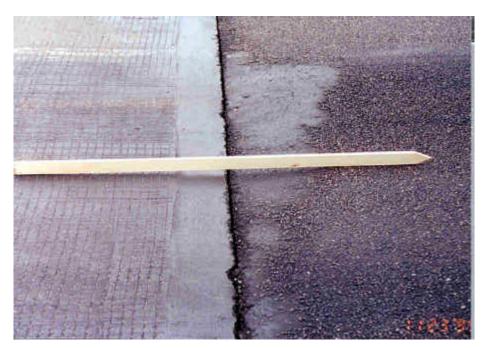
Experimental Section 1999 EB - asphalt to approach slab - dip.
